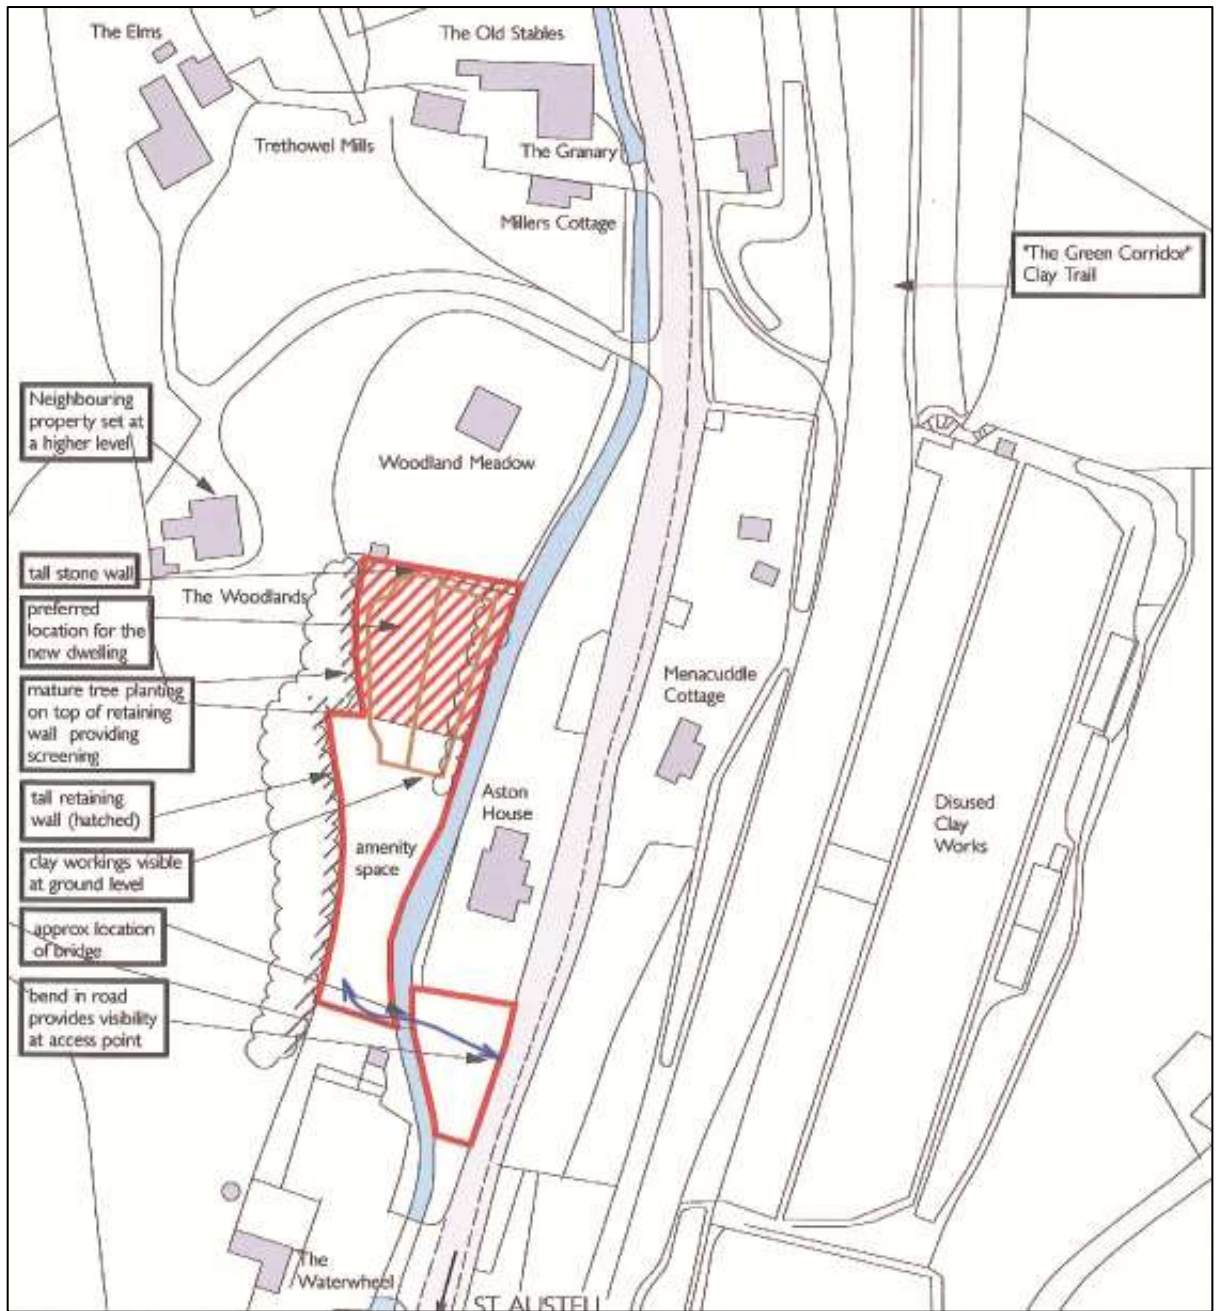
Proposed site plan; settling tanks drawn in brown (source: ALA Architects).
